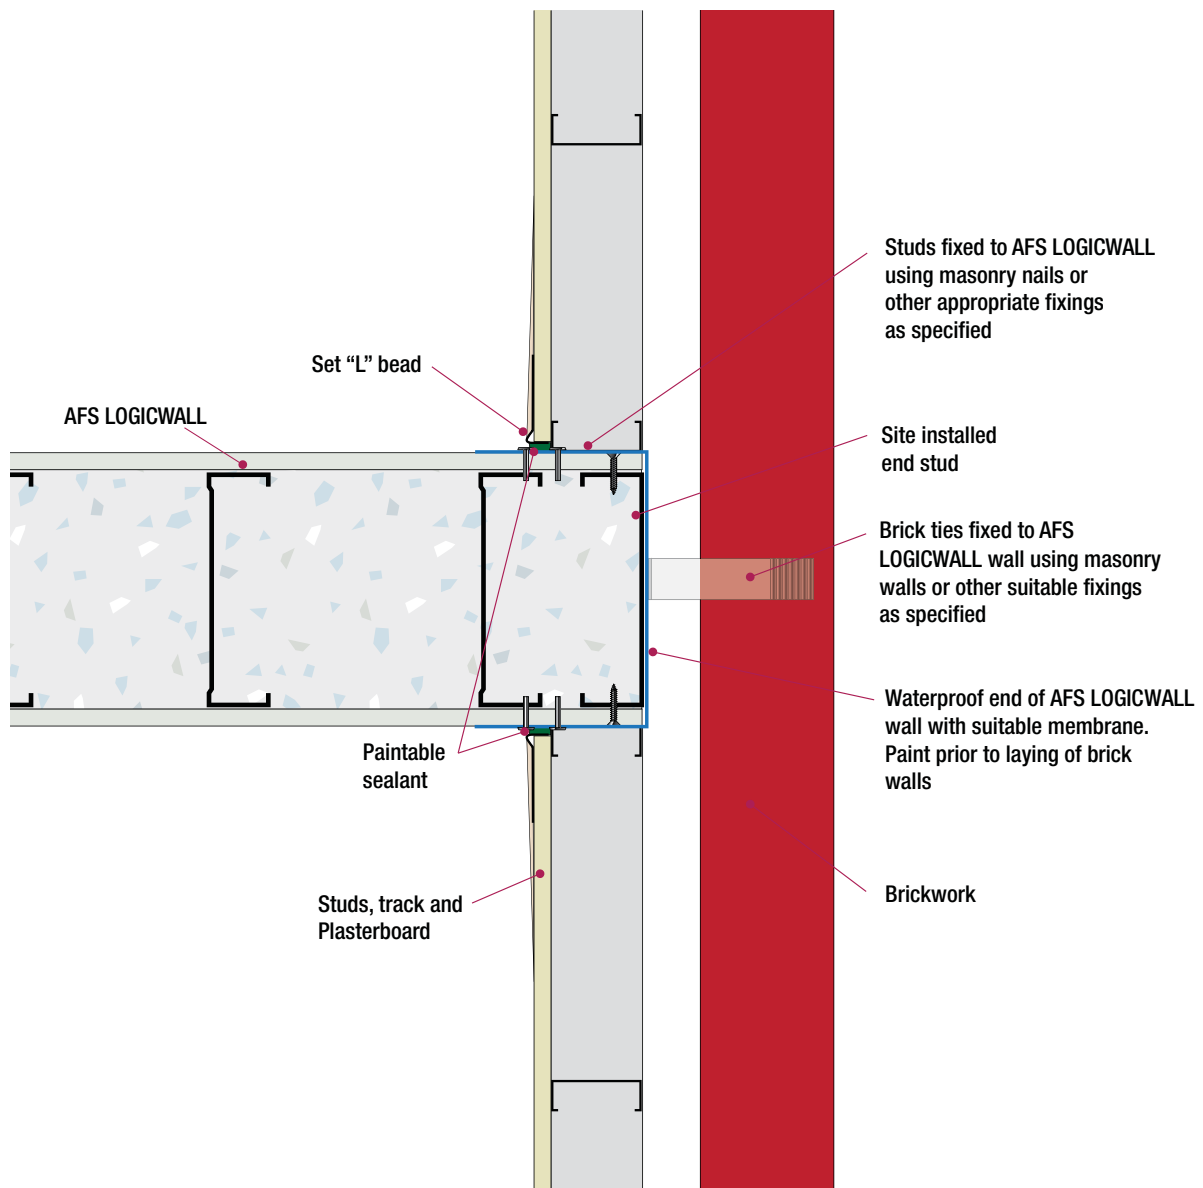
Brick Veneer Facade Over AFS Logicwall®
